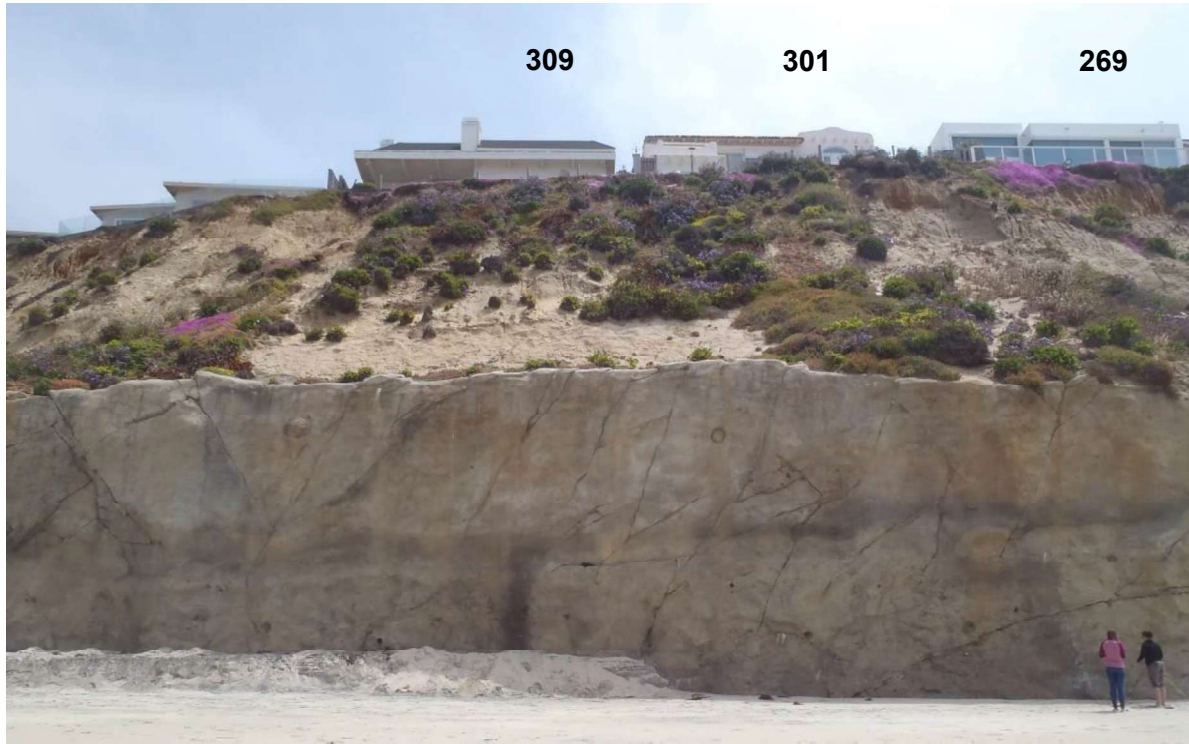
Seawall below 309 to 269 Pacific Avenue (April 26, 2023).
